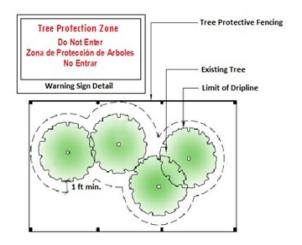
J.2: Tree Protective Fencing and Signage.
